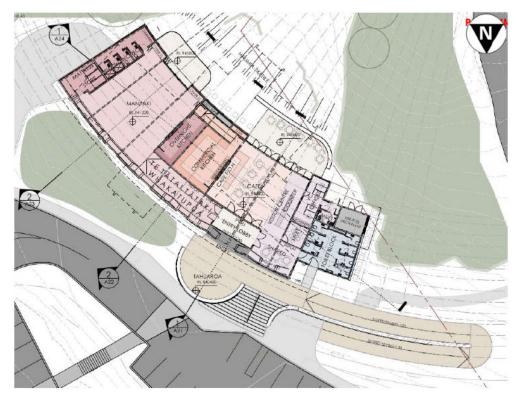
Floor plan of proposed new visitor centre building (TOA Preliminary Design Drawings - VE)
